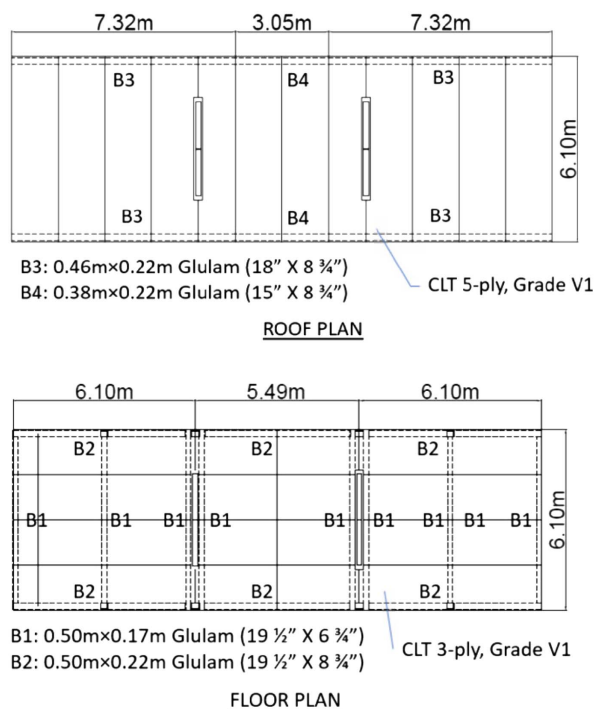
Layout of the CLT panel and glulam beams for the floor and roof.
